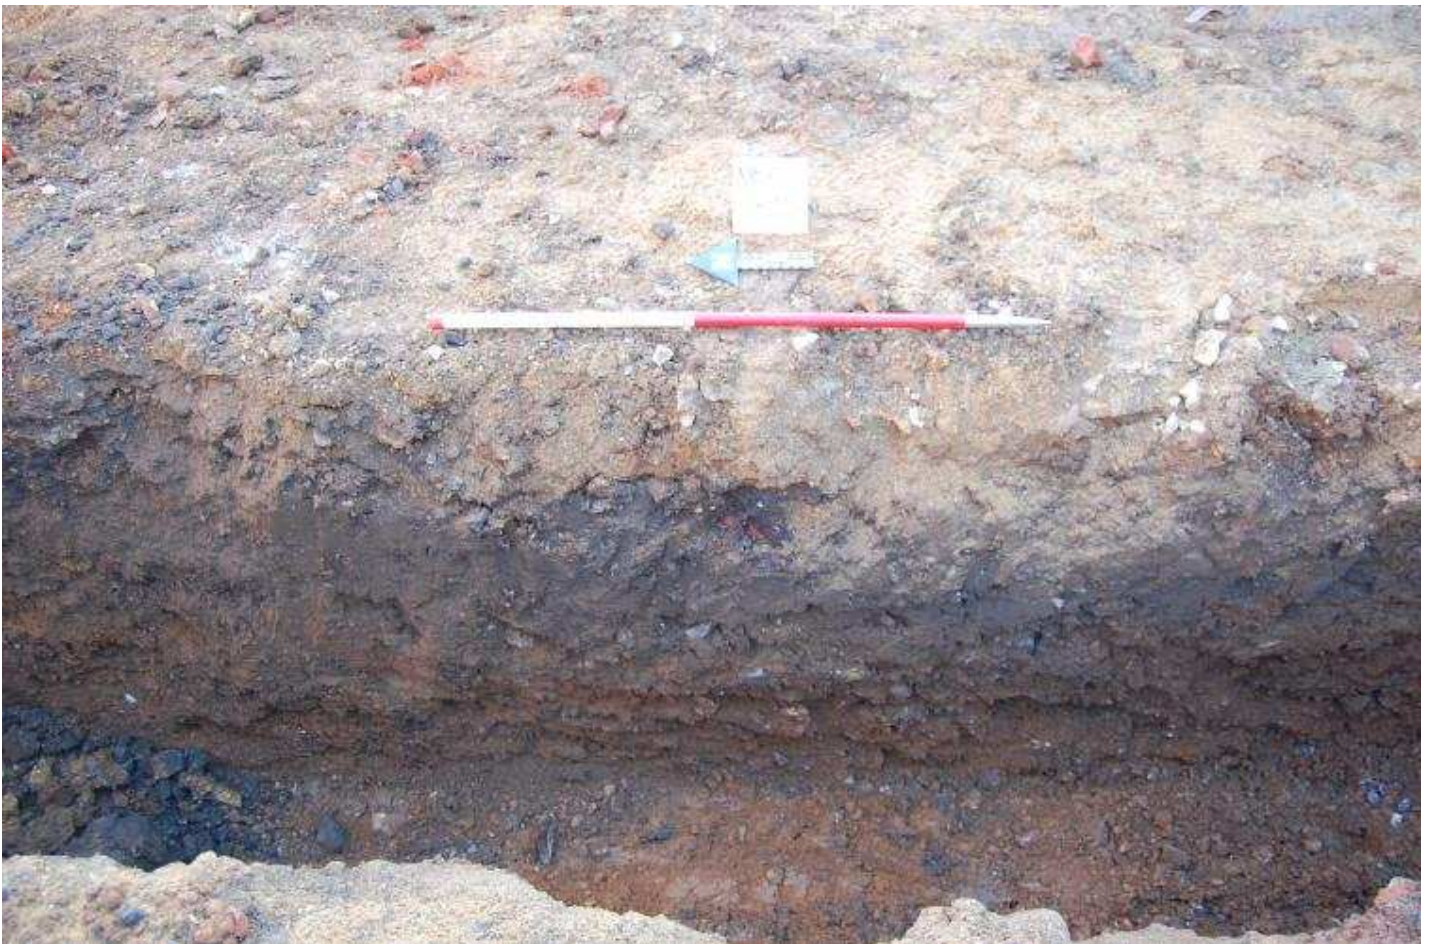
Service trenches in NE corner of site, indicative section, looking W
